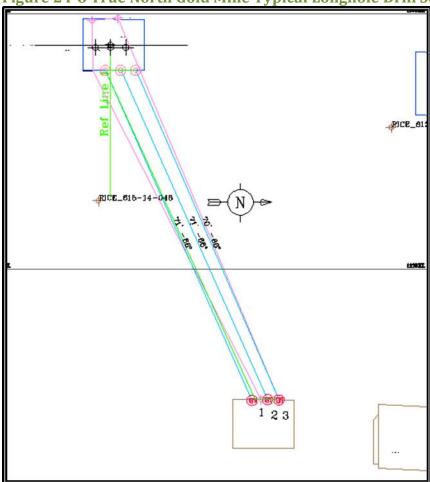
True North Gold Mine Typical Longhole Drill Section
